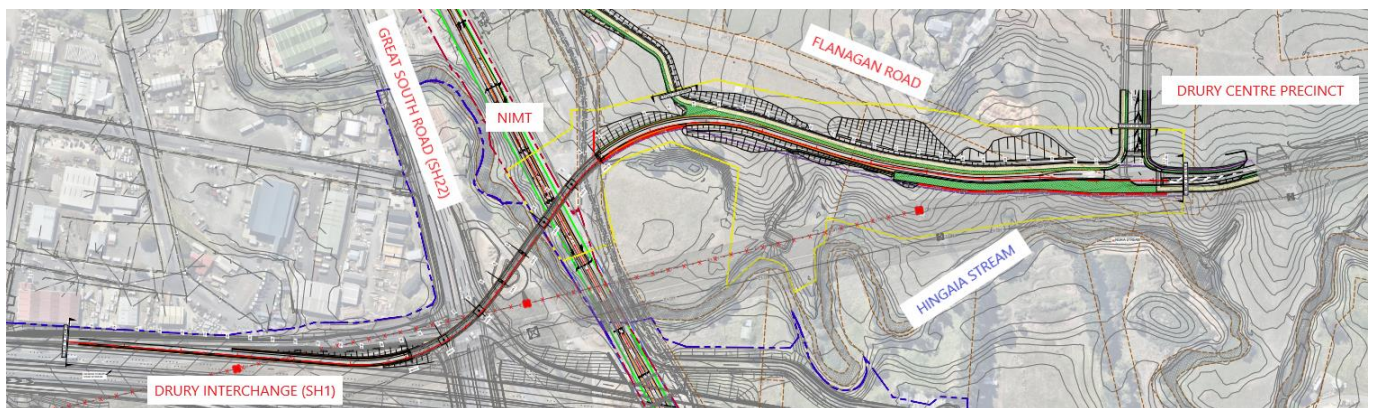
Indicative location plan of the Drury Access Ramp Project
